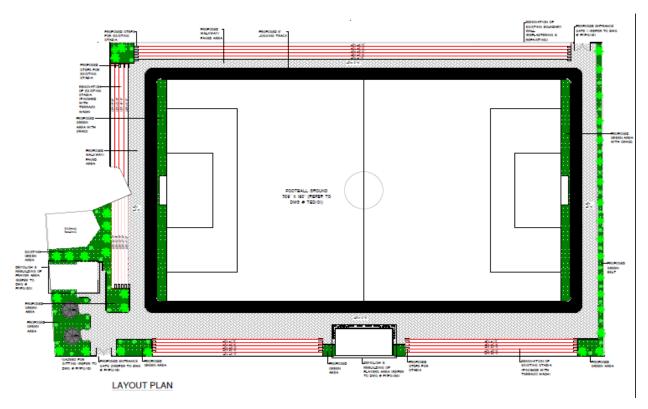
Proposed Plan of Pir Mehfooz Football Ground
